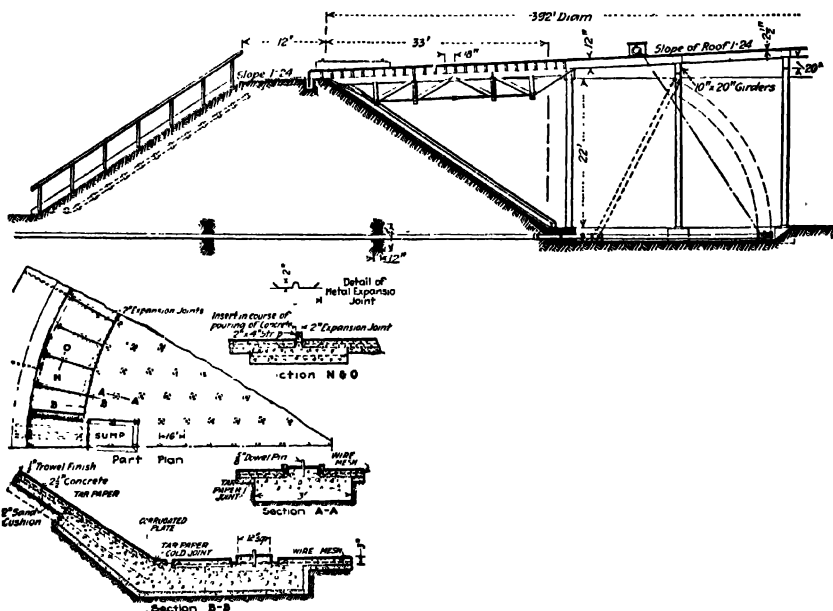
Oklahoma oil reservoir formed by lining circular embankment with concrete.
